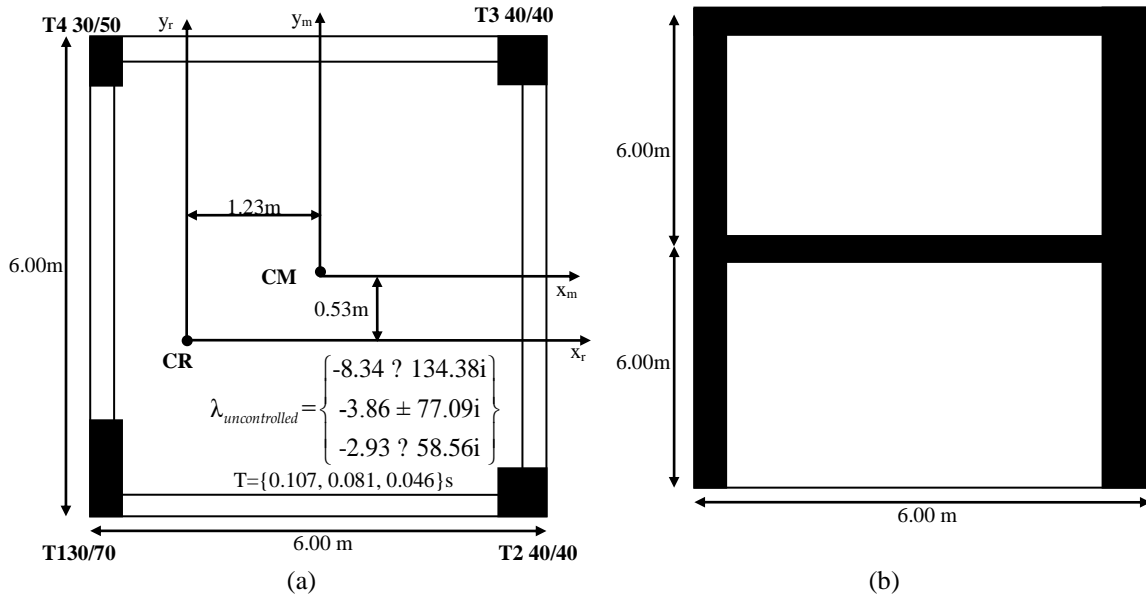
Two story irregular structure, plan, (a) and elevation, (b)
